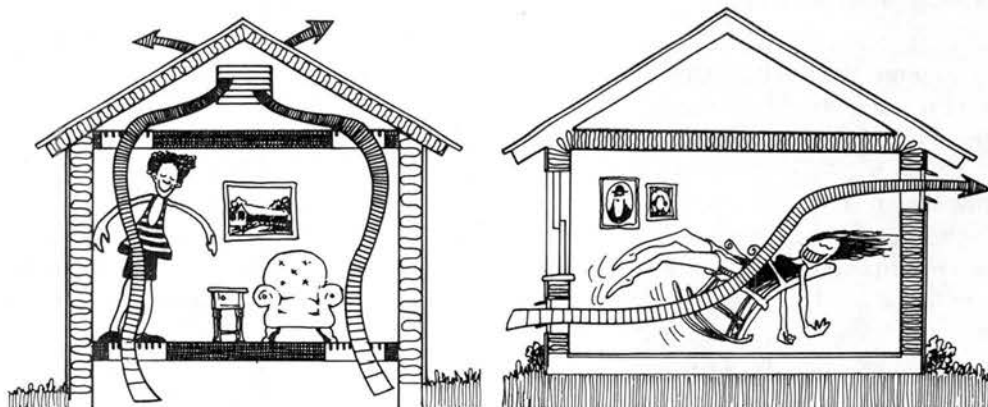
Roof and wall vents will greatly improve ventilation cooling. On the left the floor registers are coupled to a cool basement or crawl space so that as the hot air leaves through the gable vent, cooler air is drawn in. At right an intake vent is placed in the path of the prevailing summer breezes, which can provide both ventilation and evaporative cooling effects.
